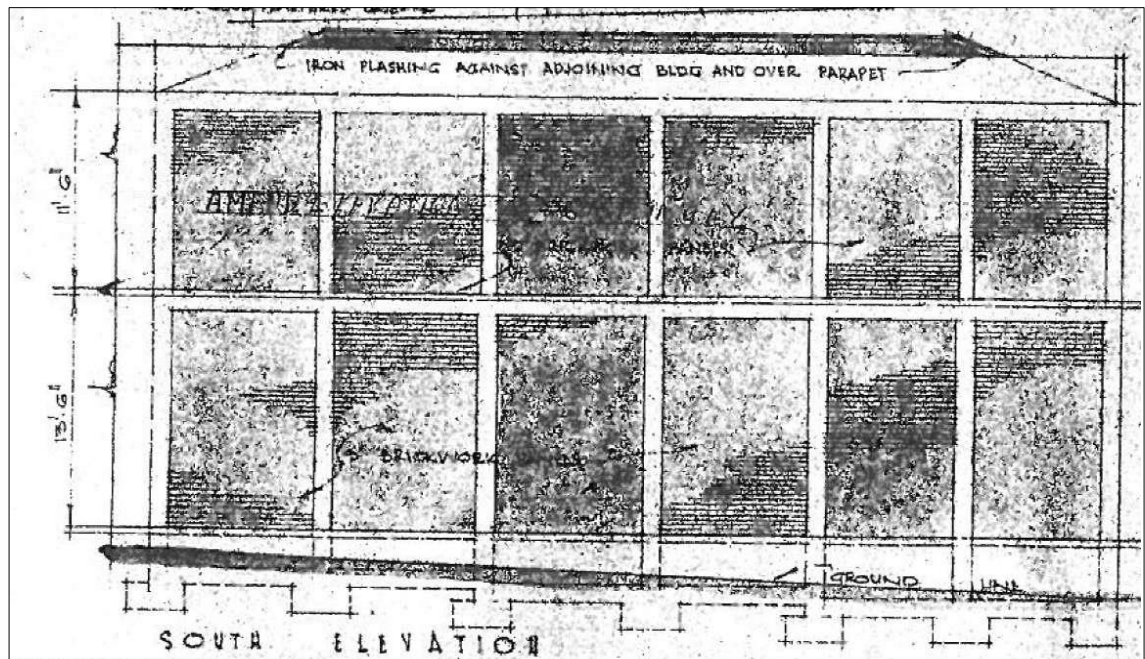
Bradley's Building South Elevation, March 1955. Source: WC Archives 00056:508:B38052
